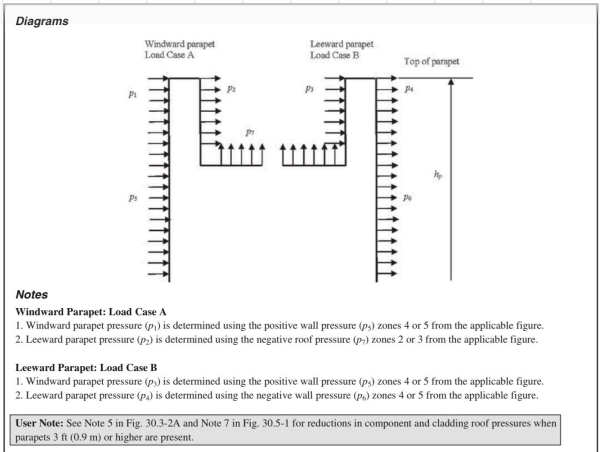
Components and Cladding, Part 6 (All Building Heights): Parapet Wind Loads, All Building Types—Parapet Wind Loads
